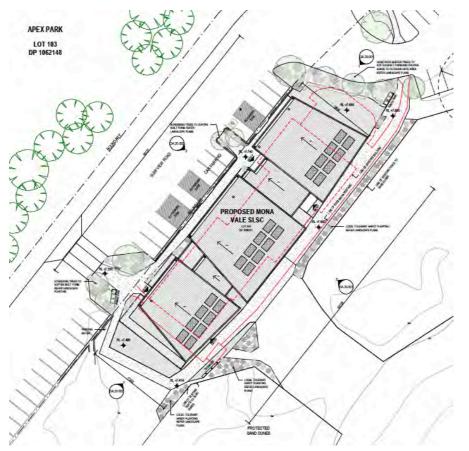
Overlay of the existing building plan highlighted in red vs the proposed building plan.
